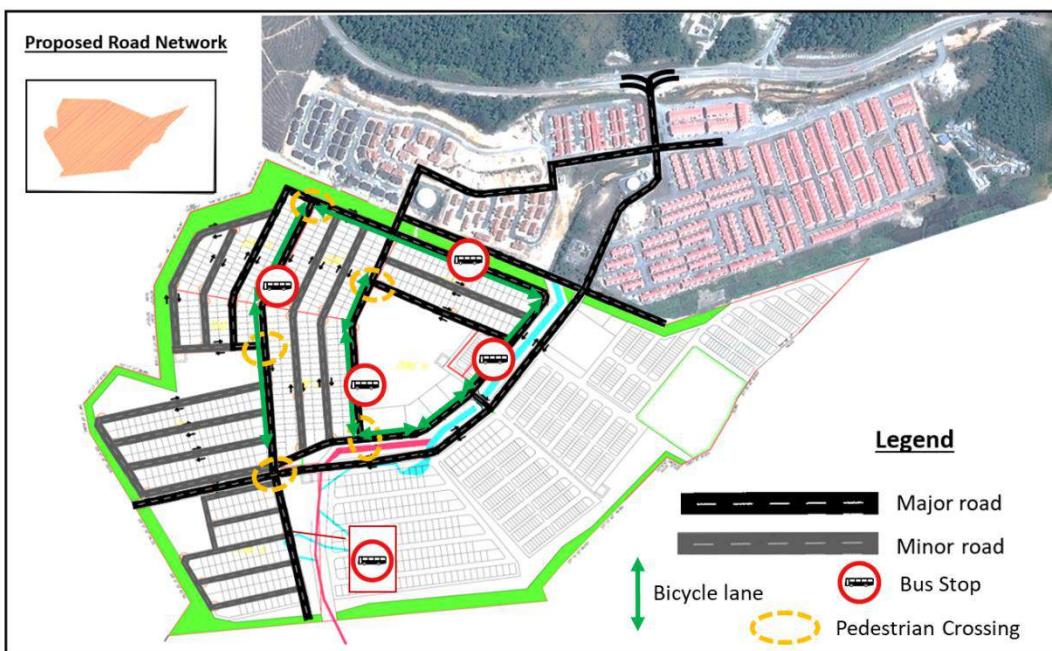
Proposed Layout of Road Network with location of Road Infrastructure Elements
